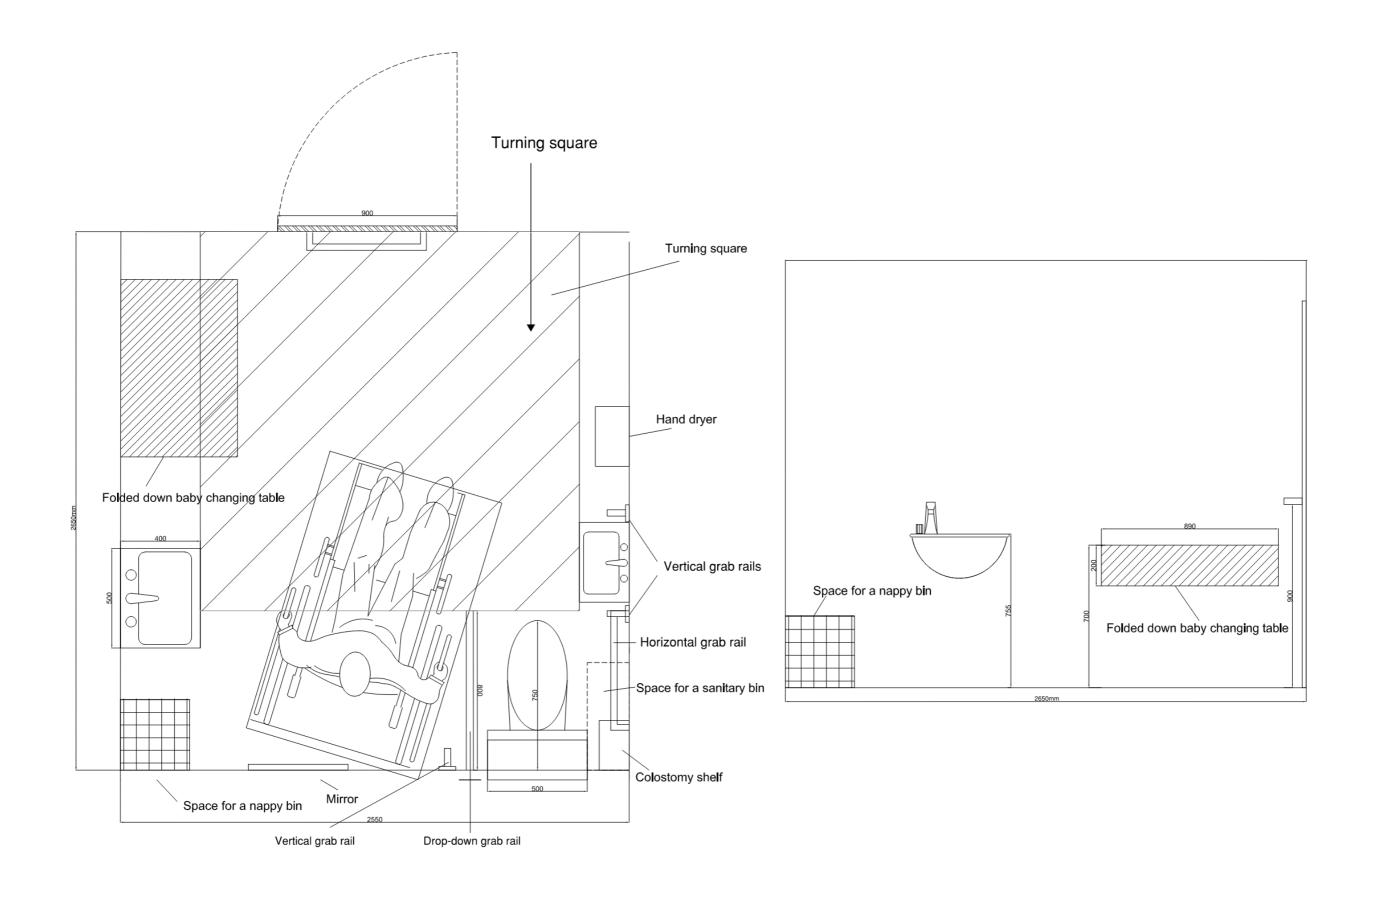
Indicative drawings for a wheelchair-accessible toilet with baby changing facilities (plan and elevation)
